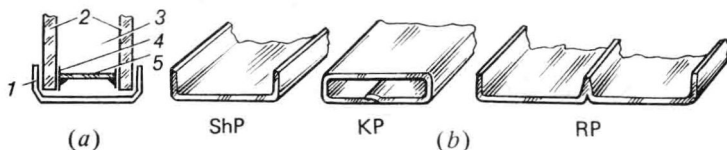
Multiple glass unit and structural glass shapes (a) single-space multiple glass unit; (b) structural glass shapes (ShP—channel, KP—box section, RT—ribbed section); (1) perchlorvinyl film; (2) glass sheets; (3) air space; (4) copper coating; (5) lead strip
